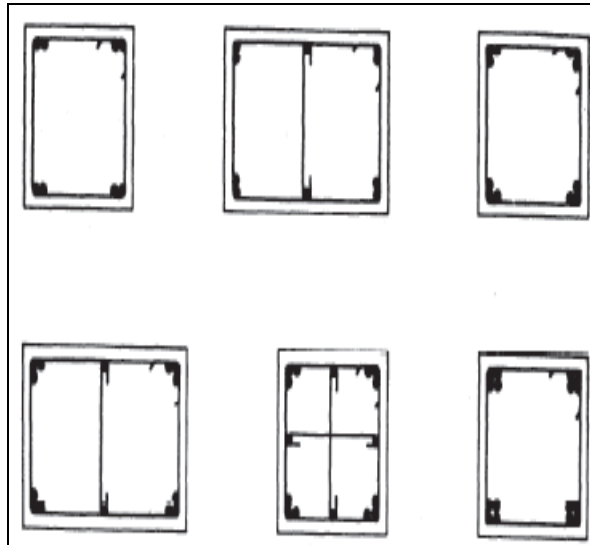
Typical detailing of column stirrups as described in SP 34
